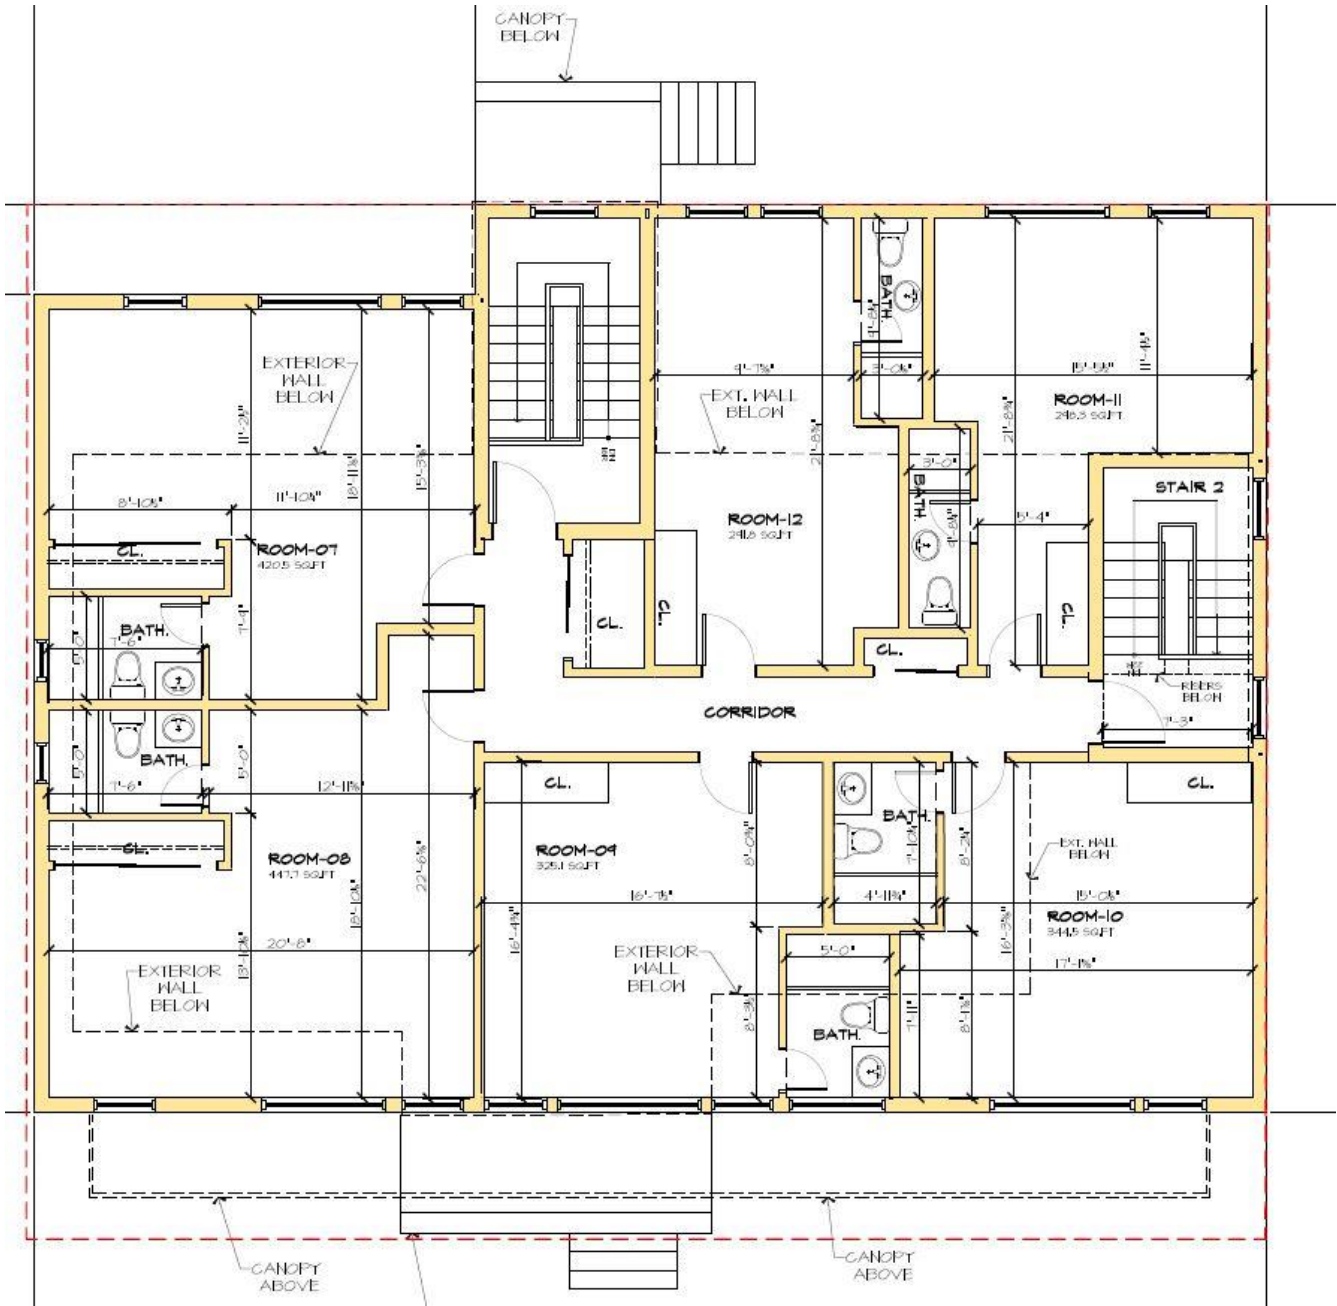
Second-floor plan (Source: Hamel Design and Planning)
